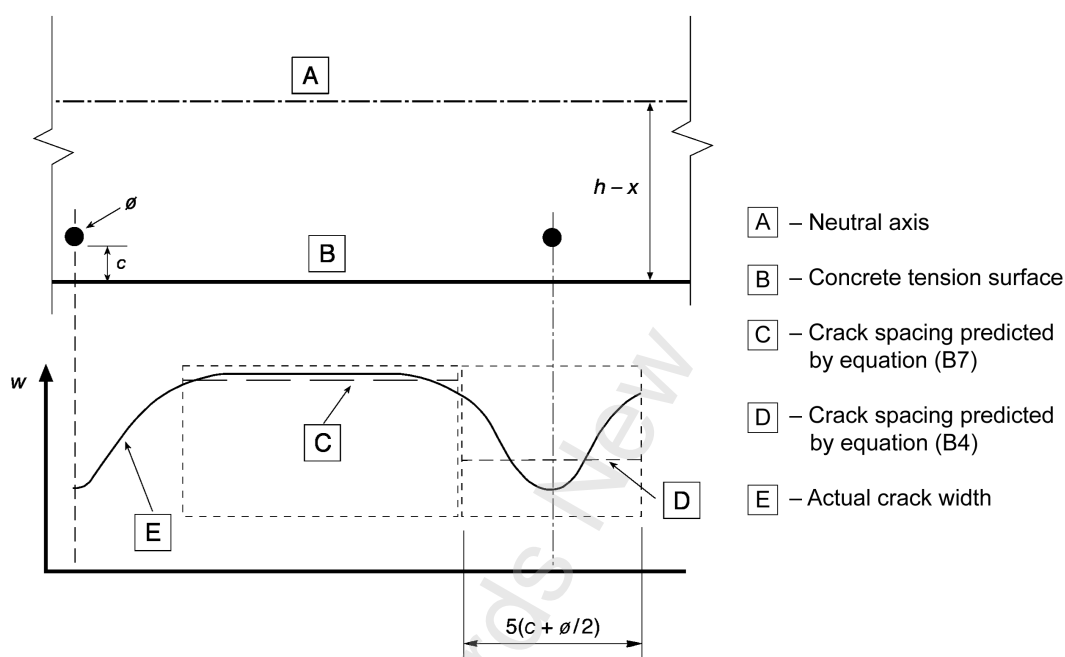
Crack width, w , at concrete surface relative to distance from bar
